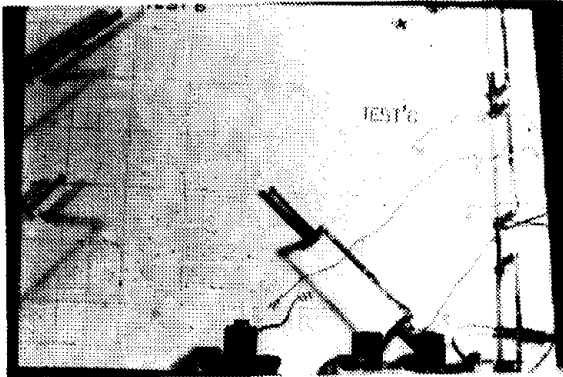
Initial Cracking of Rectangular Wall (Cyclic Loading), Specimen 6
